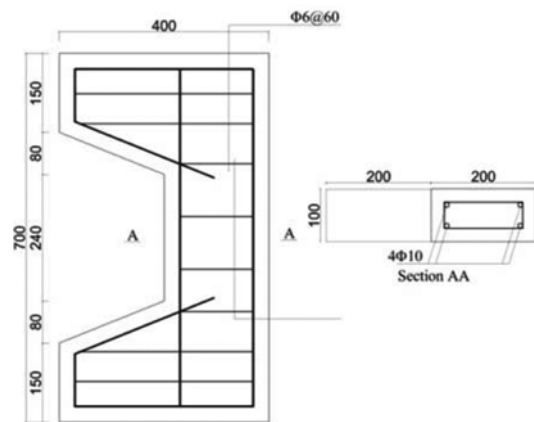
Geometry and Rebar Arrangement of RC Column Specimens
